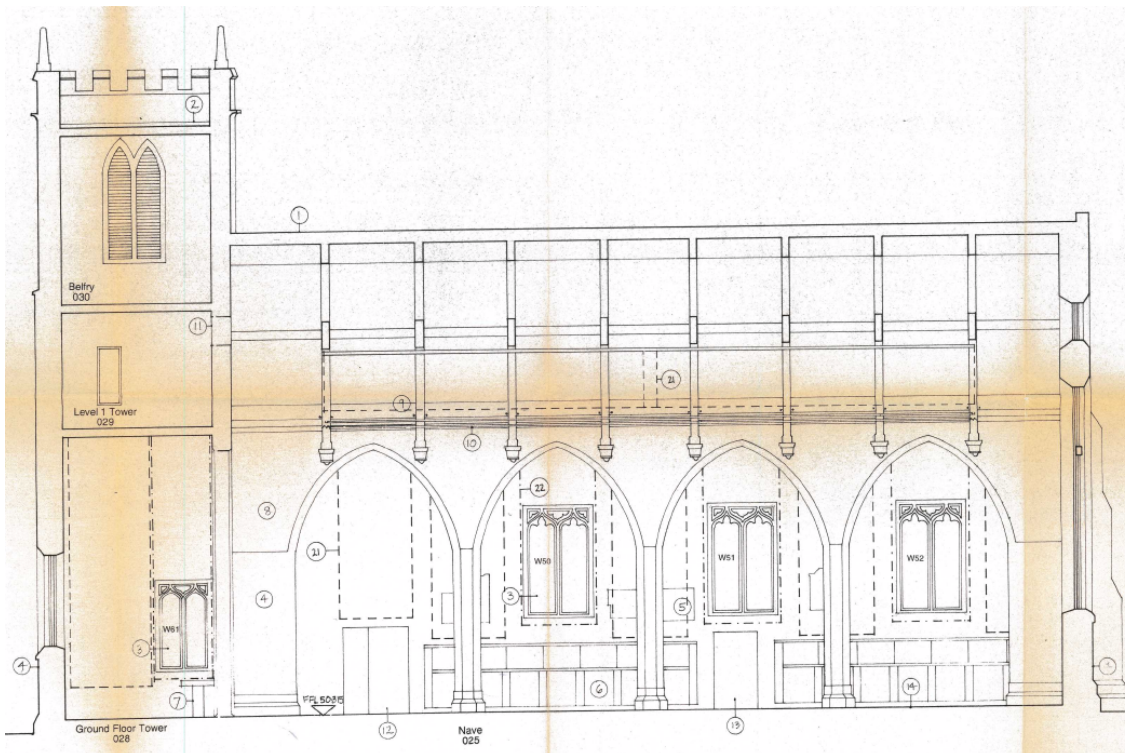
Long Section North of St. Margaret's Church as proposed [187].
